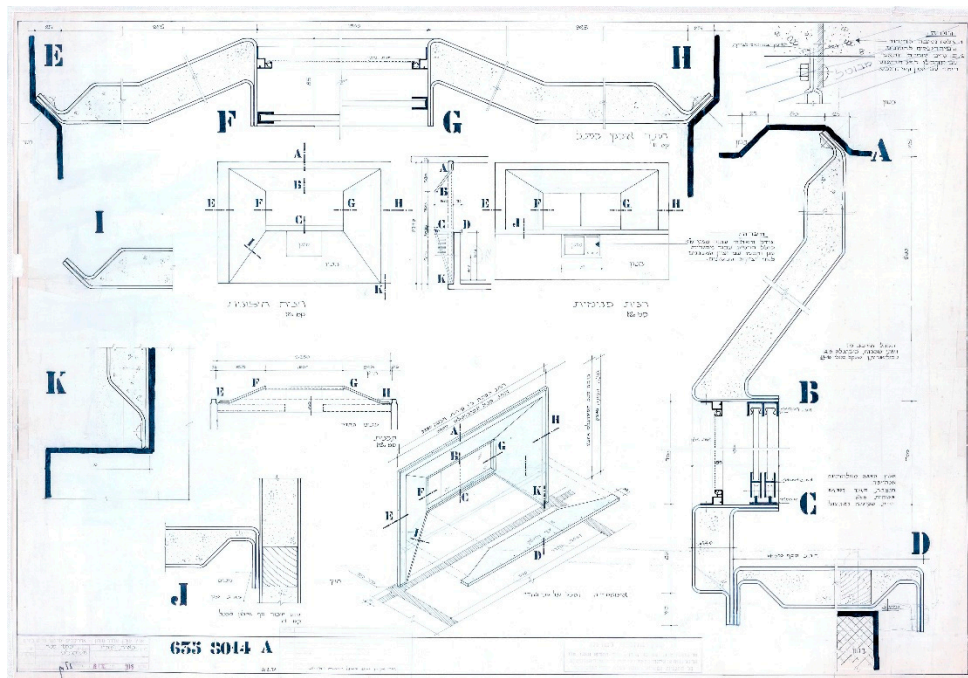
Arieh and Eldar Sharon, fiberglass panels details: plan, section and axonometric view, 1:20/1:1, 12.1.72.
